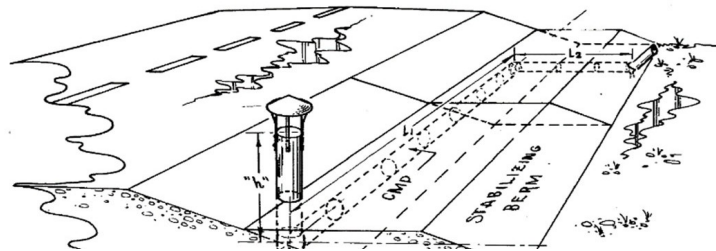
Air Convection Culverts with Chimney (Zarling, 1984)
